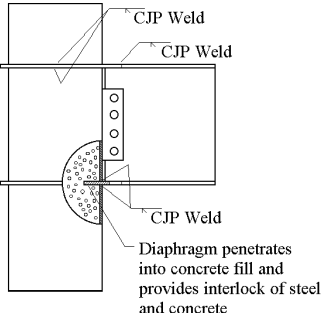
Typical Japanese Internal Diaphragm CFT Connection
